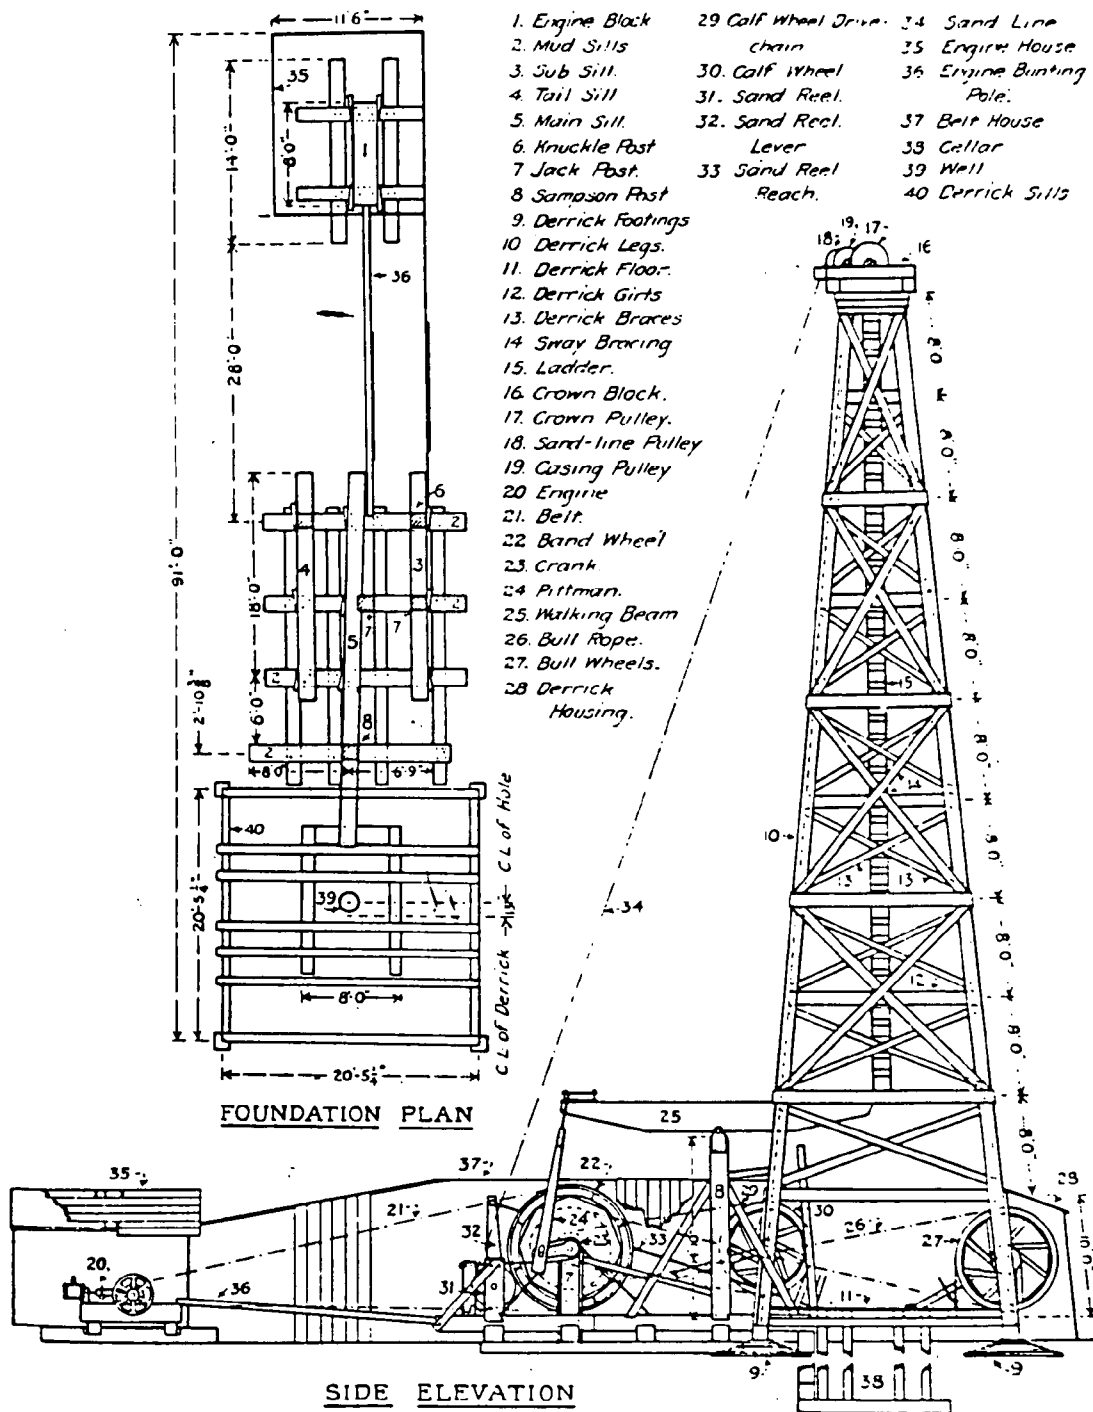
Plan and elevation of an 82-foot standard cable tool rig (Uren 1924).
